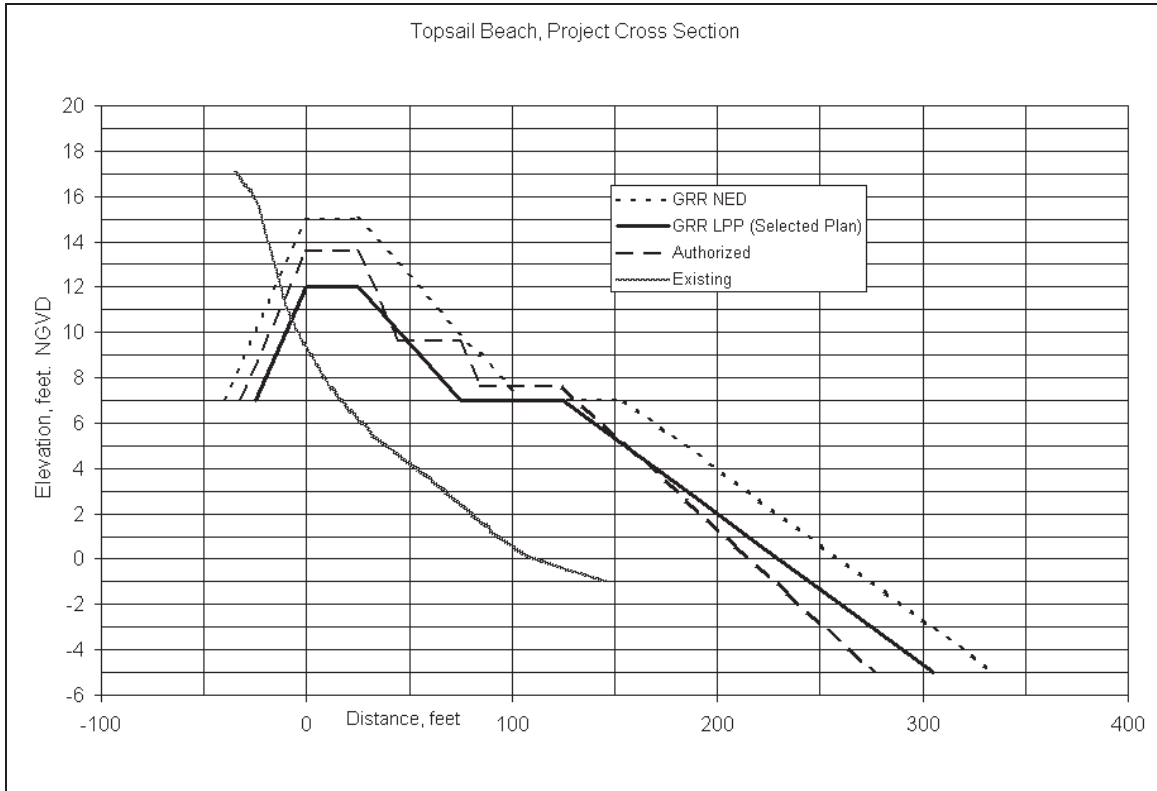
Authorized Plan (HD 393/102/2) and GRR LPP Plan 1250X, Cross section view
